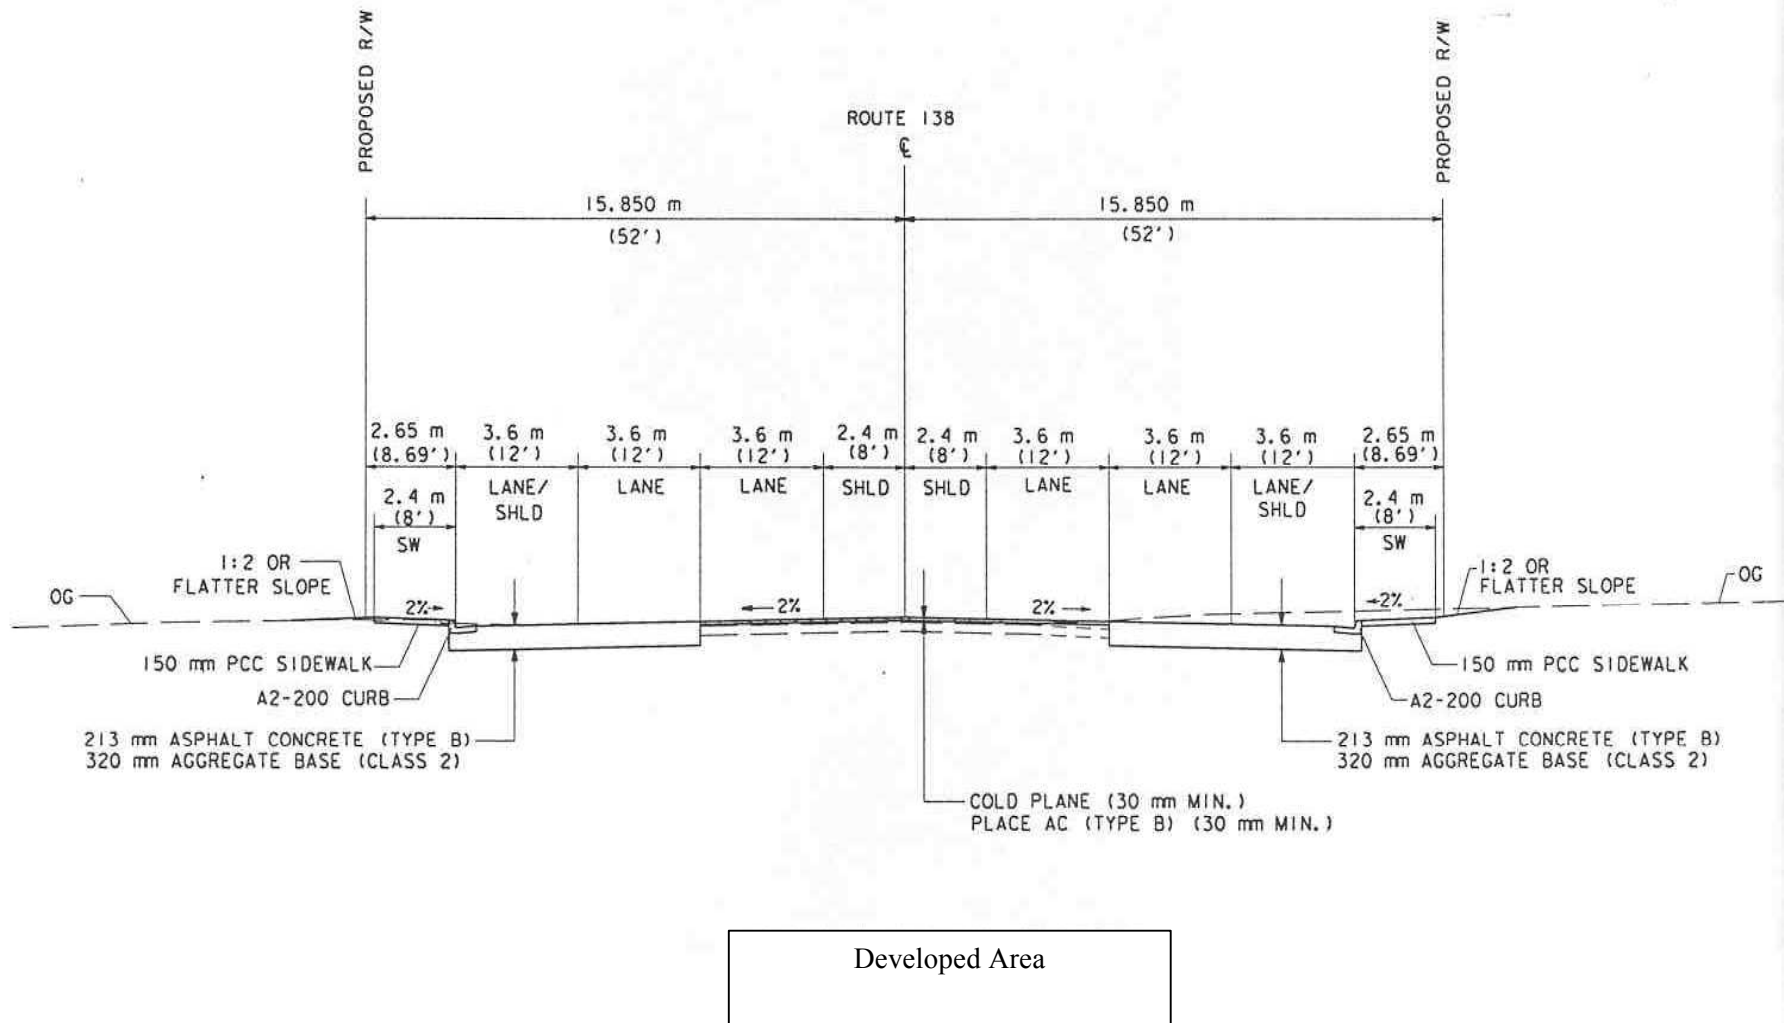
TYPICAL CROSS-SECTION FOR DEVELOPED AREA
